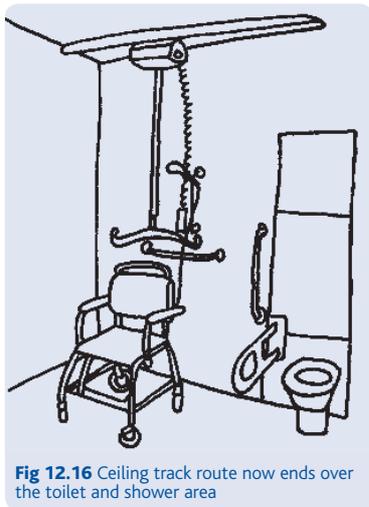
Ceiling track route now ends over the toilet and shower area
